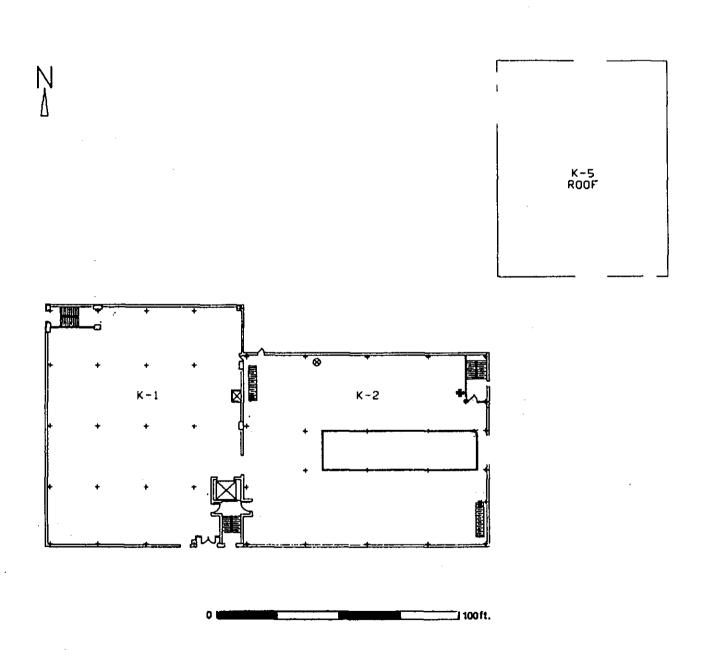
SECOND FLOOR LEVELS OF K-1 AND K-2, AND K-5 ROOF
